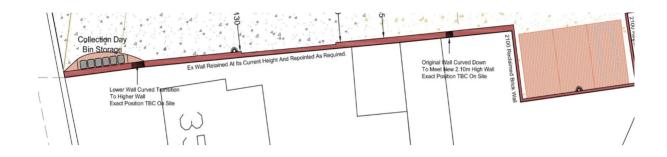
The wall (approved plan: planning permission 16/02725/FUL)
